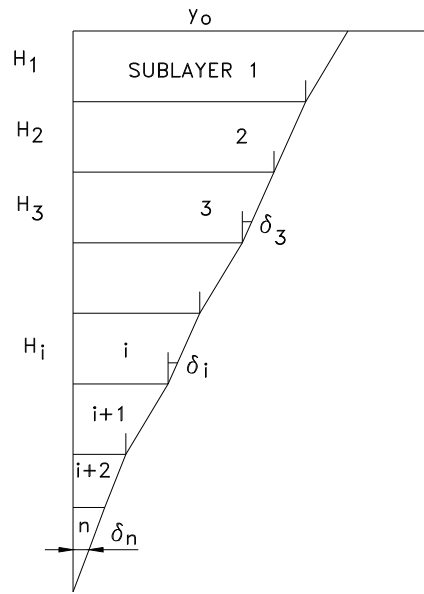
Assembling of pile head deflection using the multi-sublayer technique
